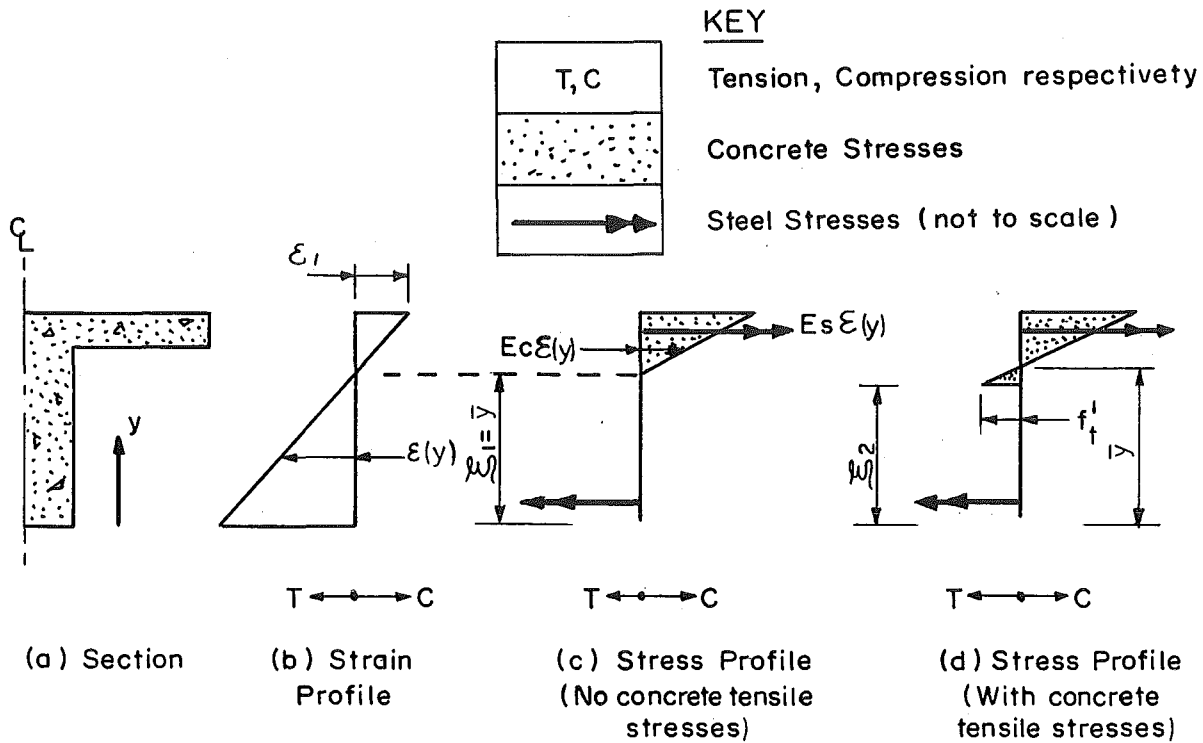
EQUILIBRIUM OF CRACKED REINFORCED CONCRETE SECTION
